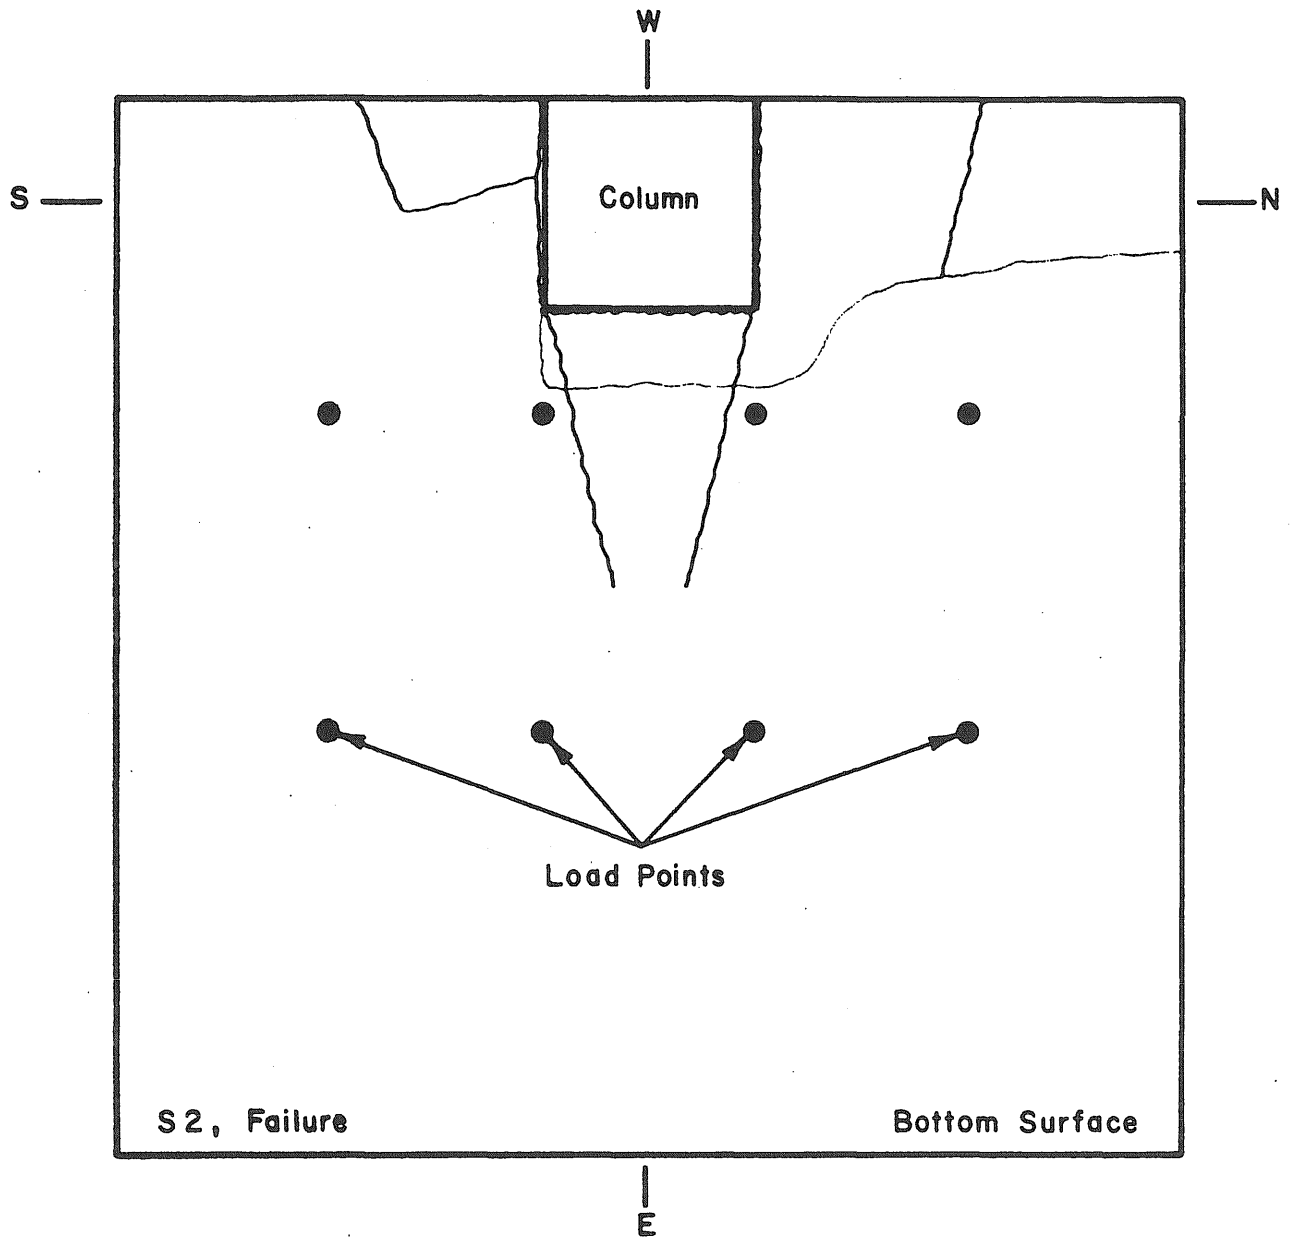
Crack Pattern at Failure on the Bottom Surface of Specimen S2
